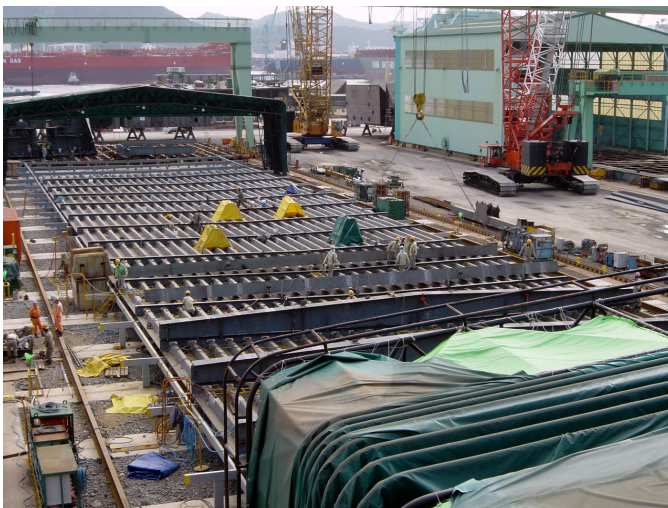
Completed Orthotropic Deck with Floorbeam (TNC)
